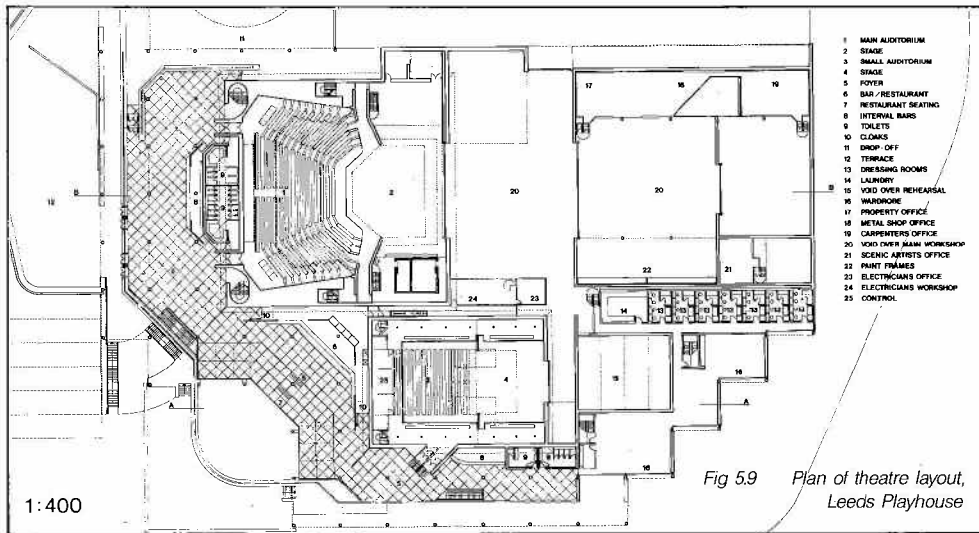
Plan of theatre layout, Leeds Playhouse
